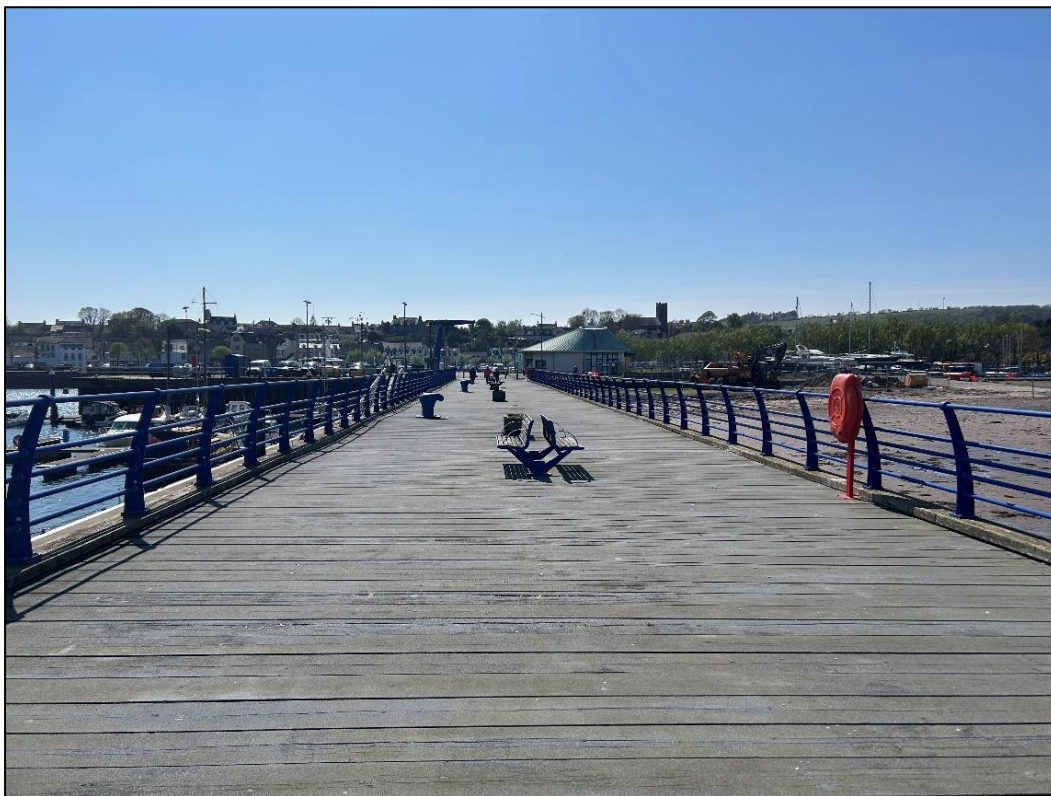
View from Coastal Walkway path towards the existing West Pier and existing Breakwater
